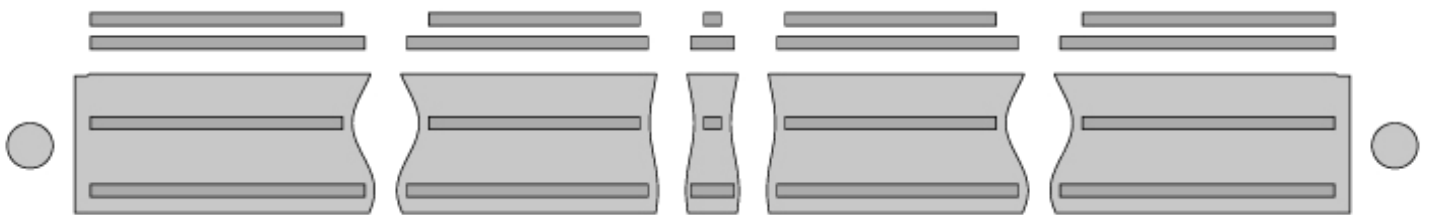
CUTTING PATTERN OF A TENSAIRITY® SEGMENTED ARCH
